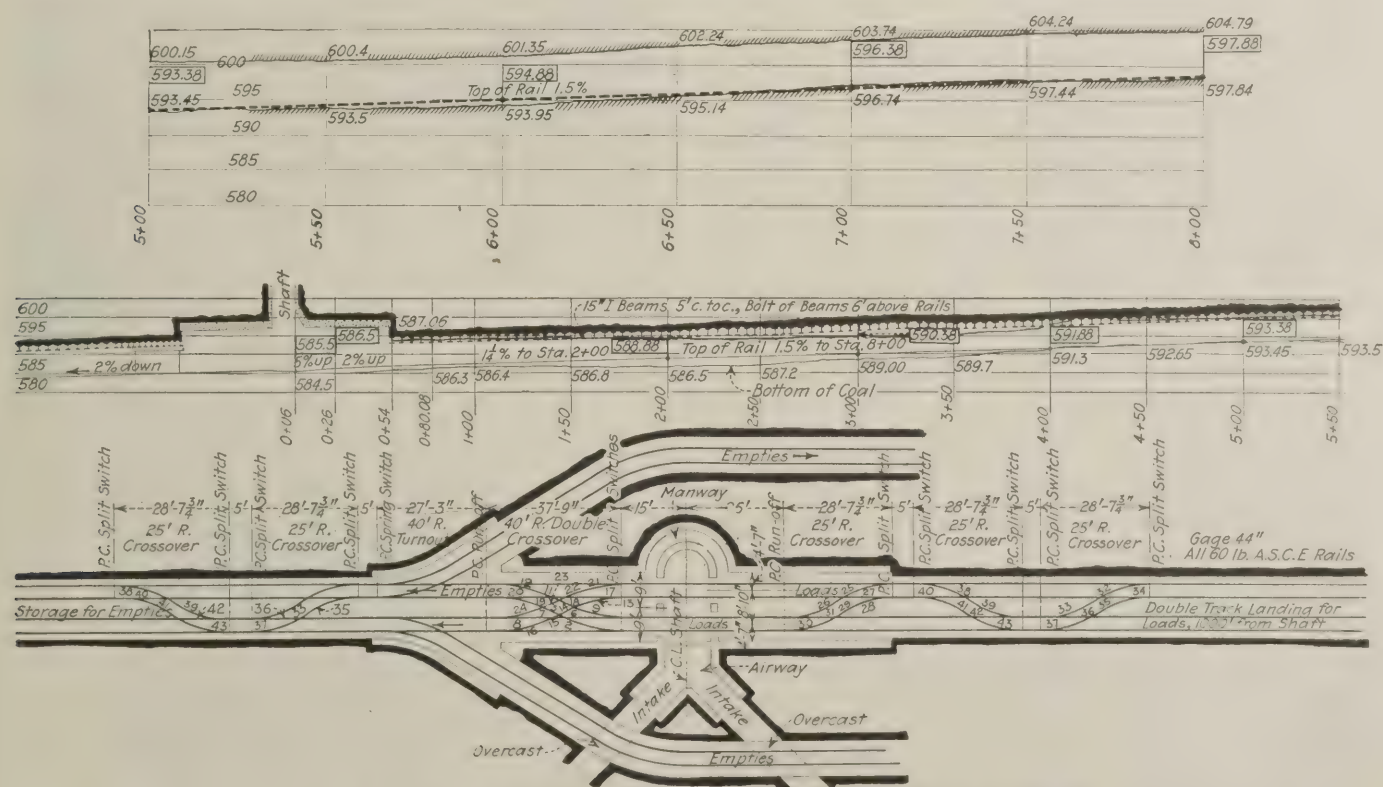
DETAILS OF THE SHAFT BOTTOM AND TRACKAGE LAYOUT
